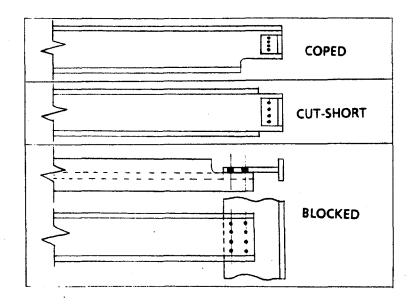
Cut Short, Coped, and Blocked Beam Flanges
